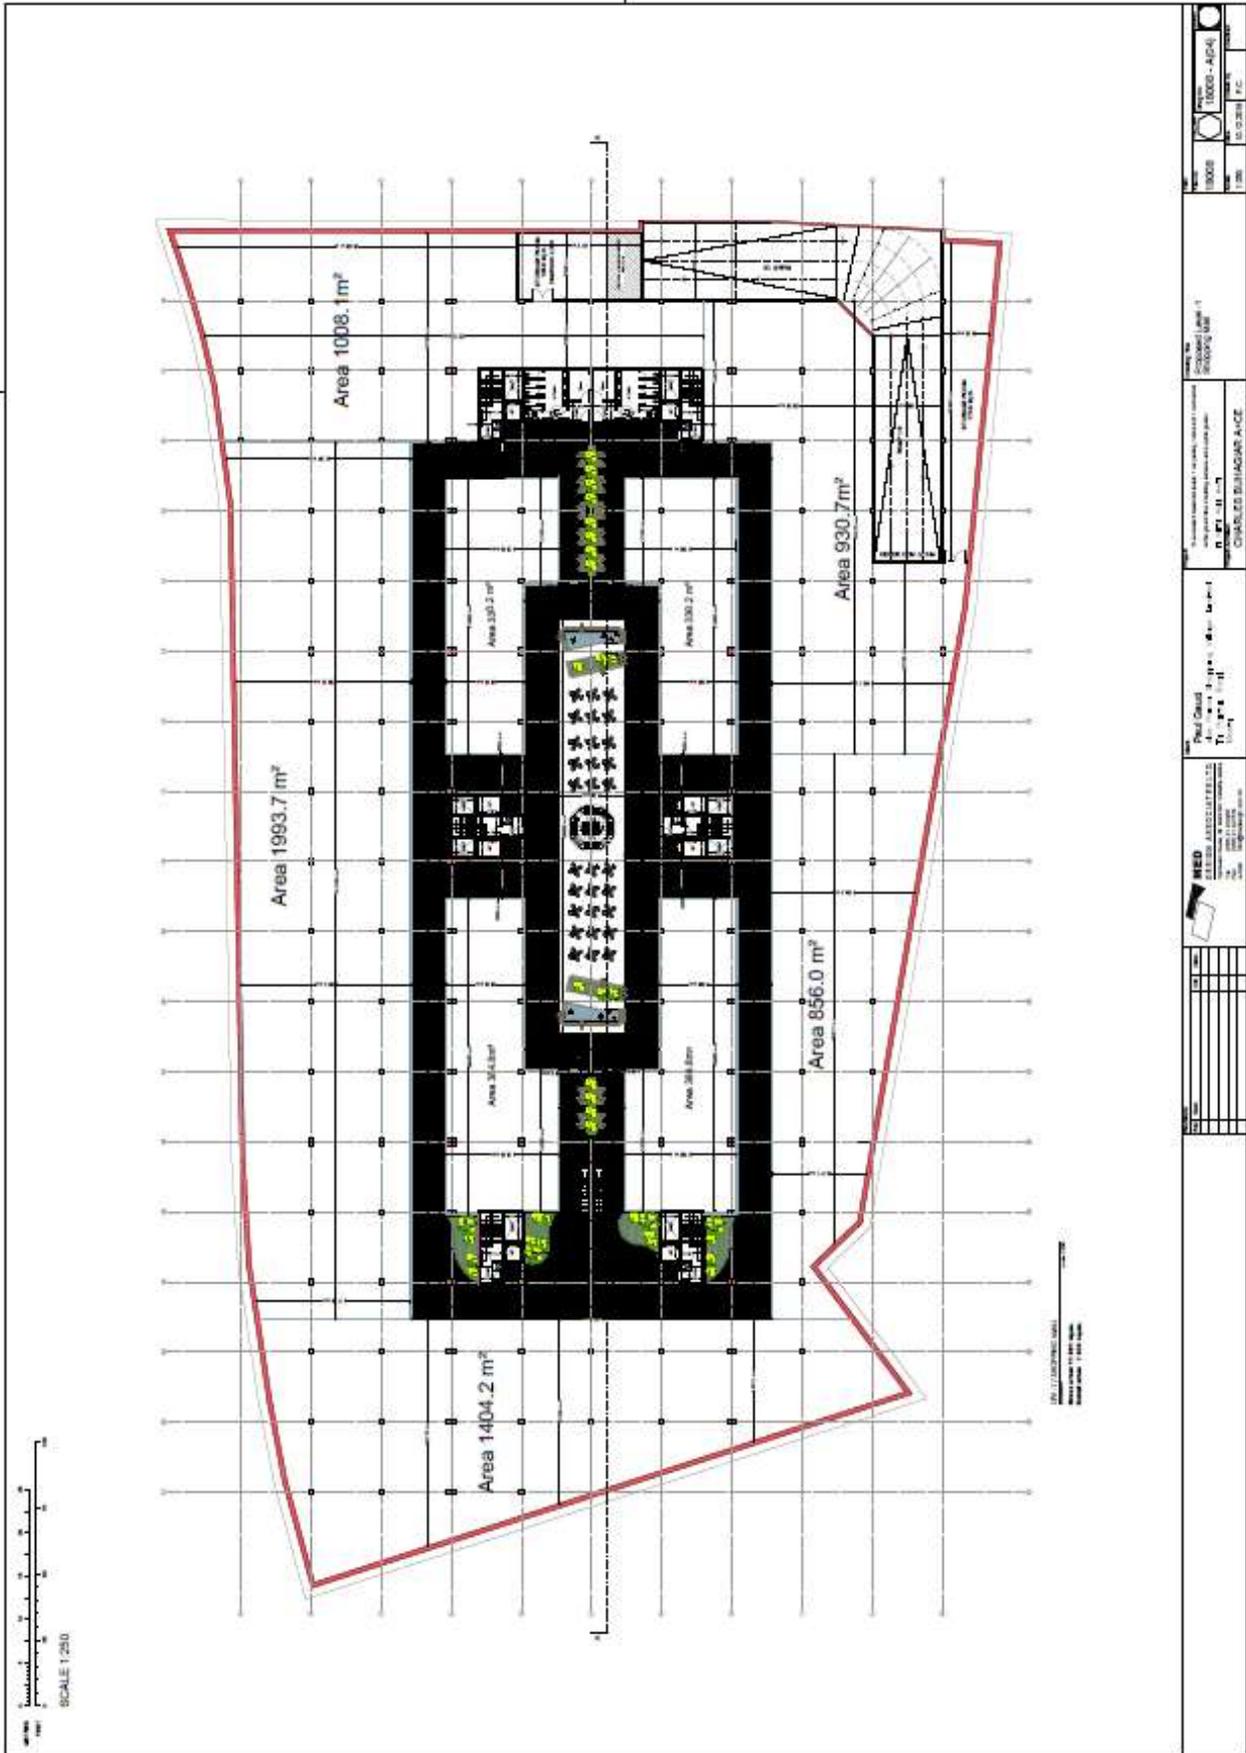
Level -1 Retail Floor Plan.(not to scale).
